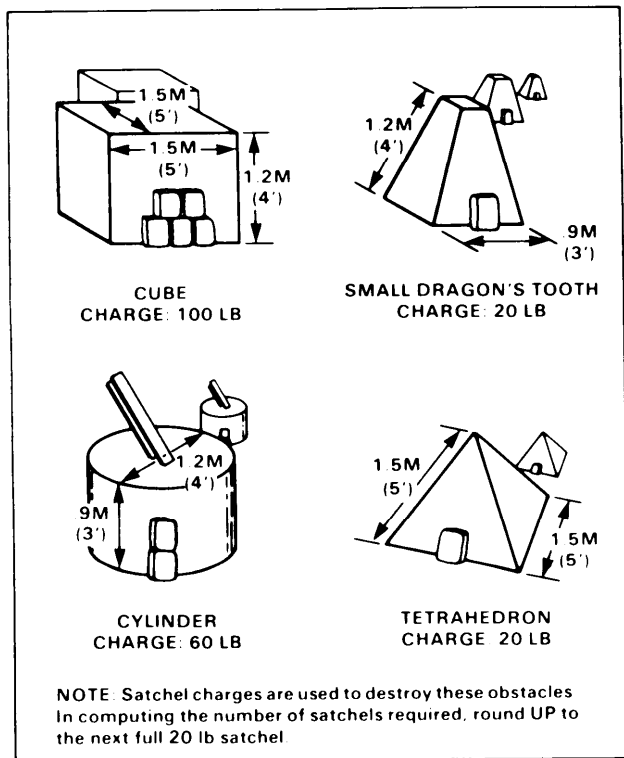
Explosive packs needed to destroy typical small concrete obstacles
